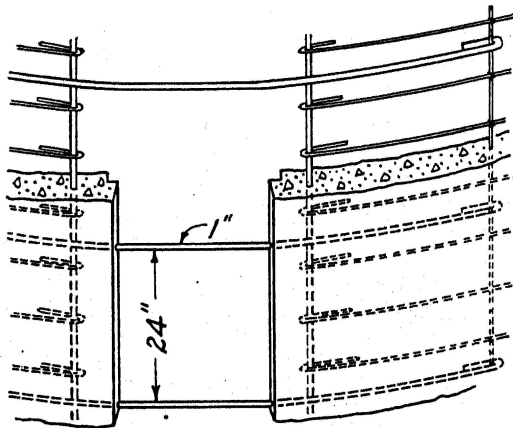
Spacing of reinforcement rods in building concrete silo with continuous doorway.
